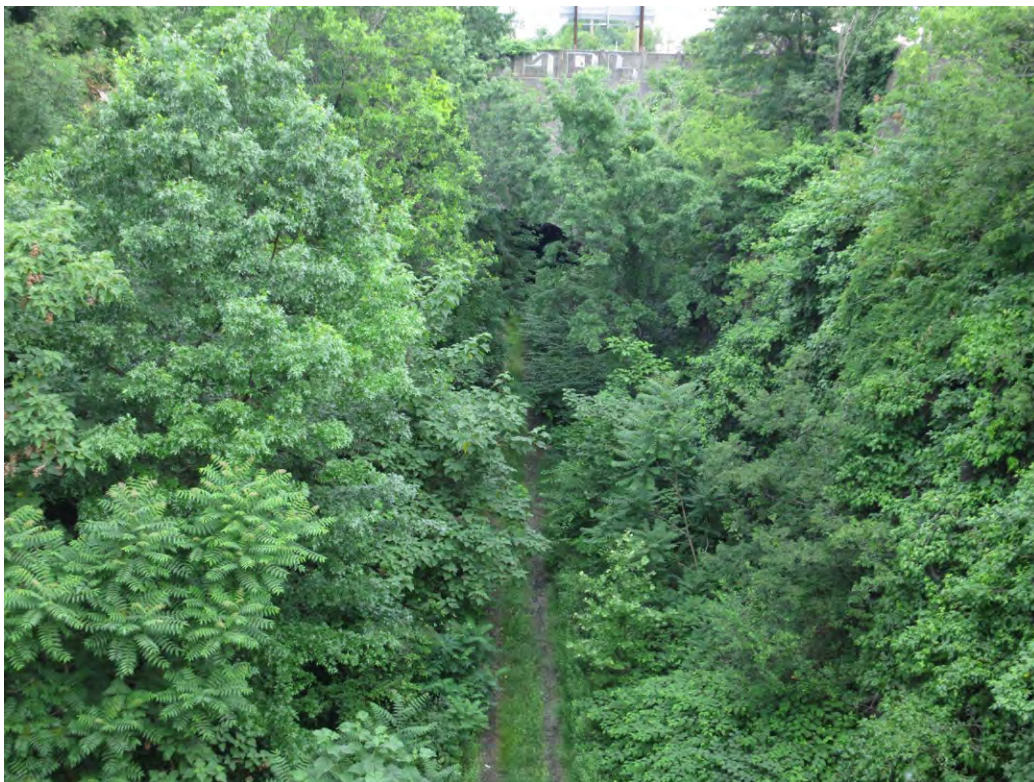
Overview of the Erie Railroad Bergen Archways Historic District, with the Central Avenue Bridge and Tunnel visible in the background, City of Jersey City.
